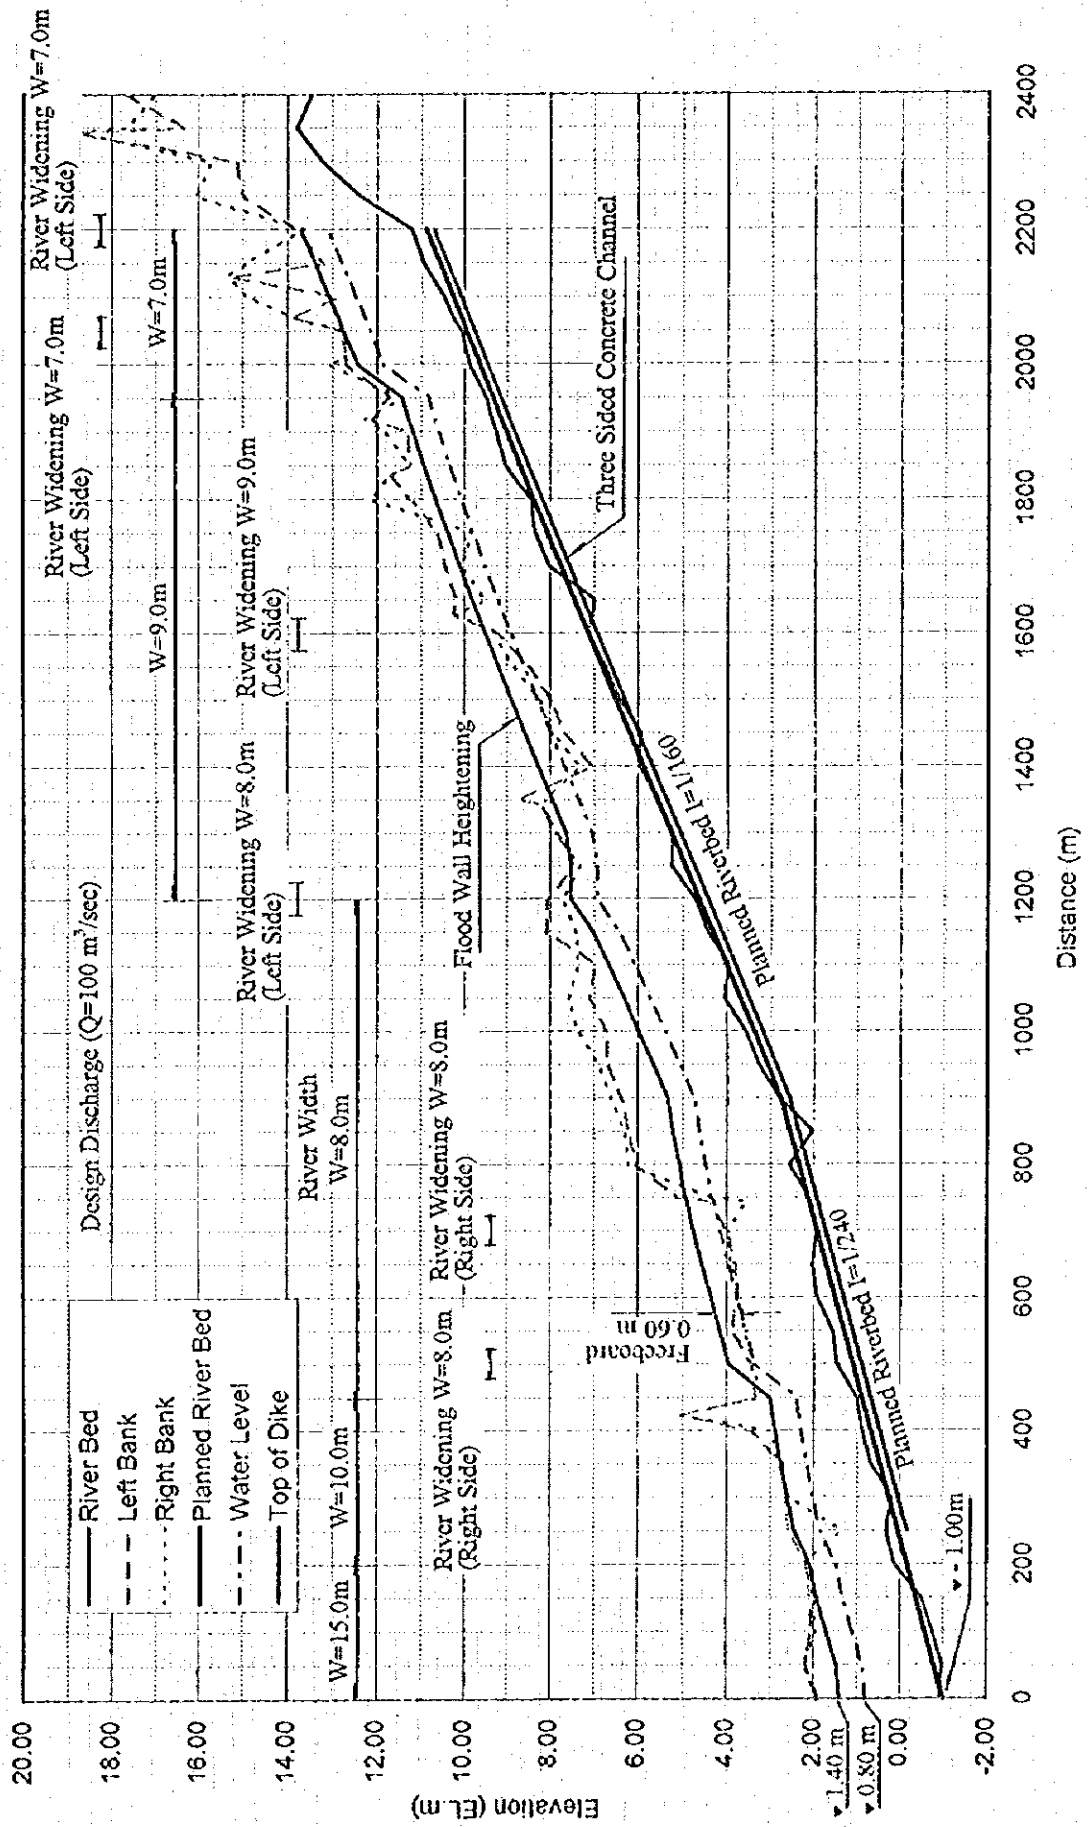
Longitudinal Section of Batu Gajah River Improvement Plan
